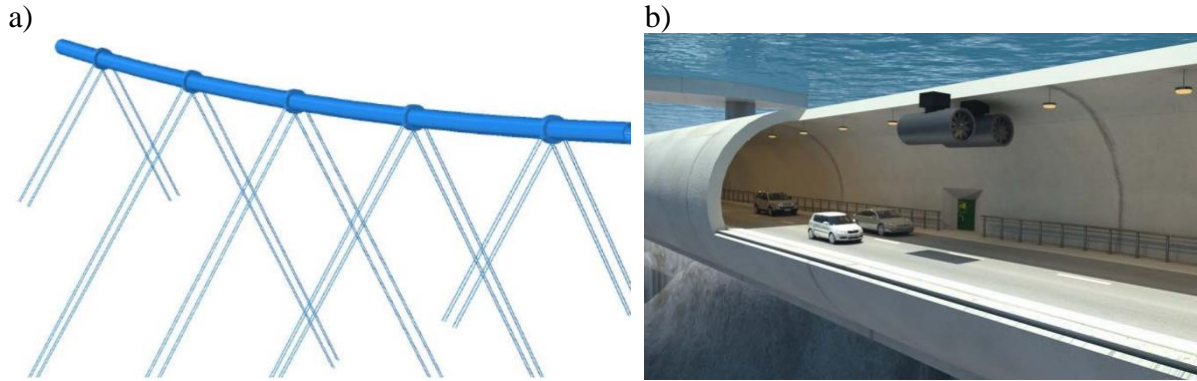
Submerged floating tunnel; a) Tunnel and mooring lines; b) Tunnel detail
